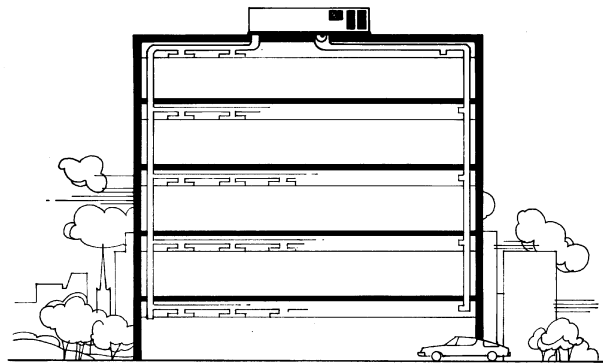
Multistory Rooftop Installation of Single-Package Unit
